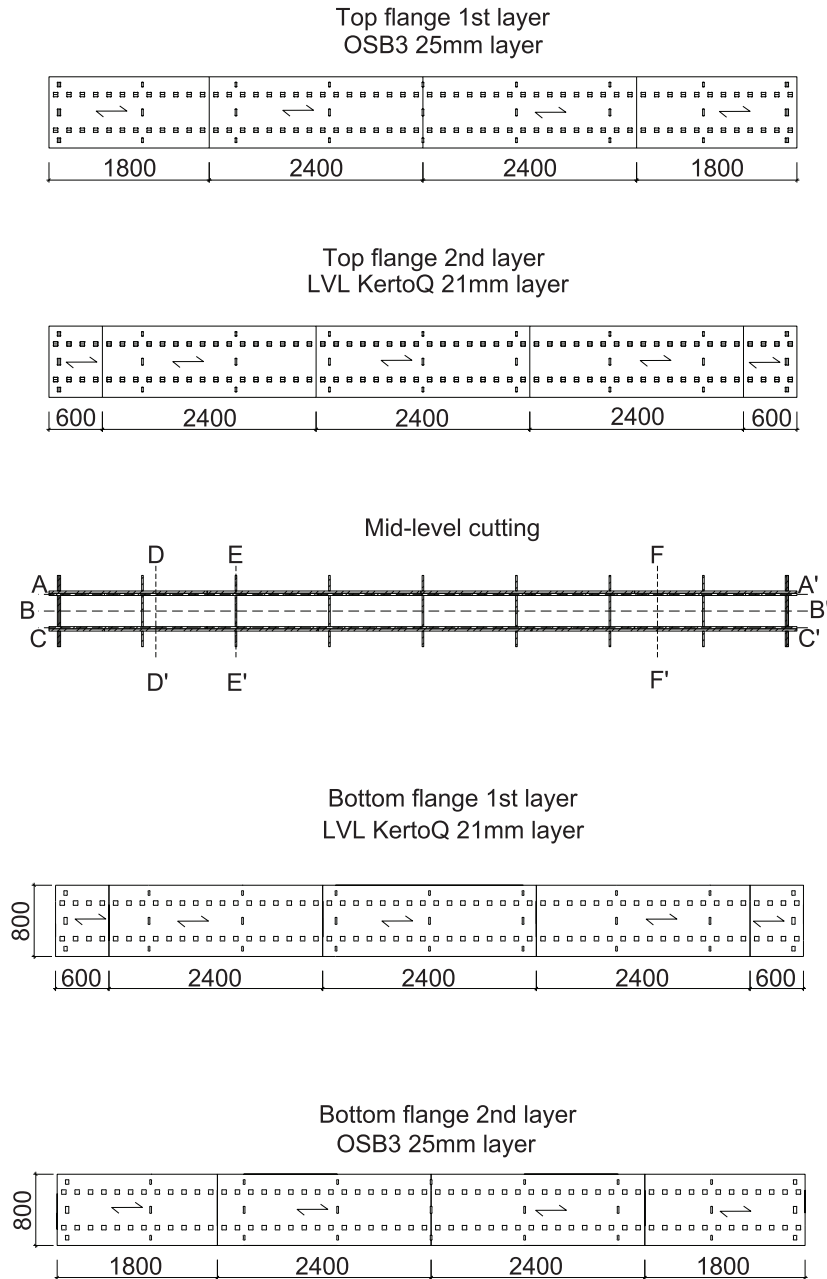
Detailed plan of large-scale specimens: part 1.
